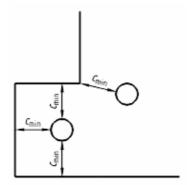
Minimum dimension to prevent cracking of concrete of prestressed beams
